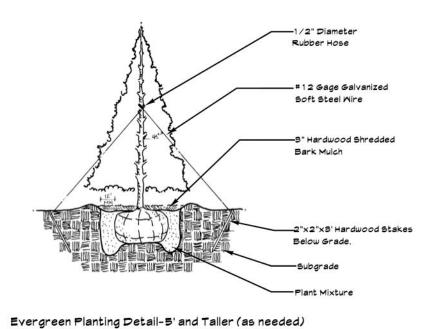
EXHIBIT E LANDSCAPE PLAN – GREENBELT (HIGHLAND ROAD/M-59)
